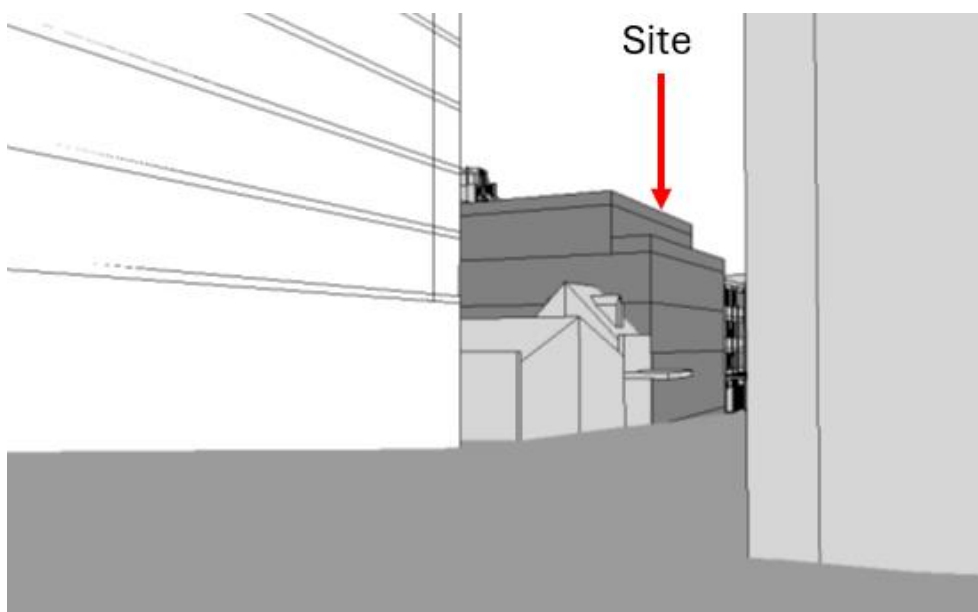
View of building envelope as amended following public exhibition, looking in a north-westerly direction up Riley Street
